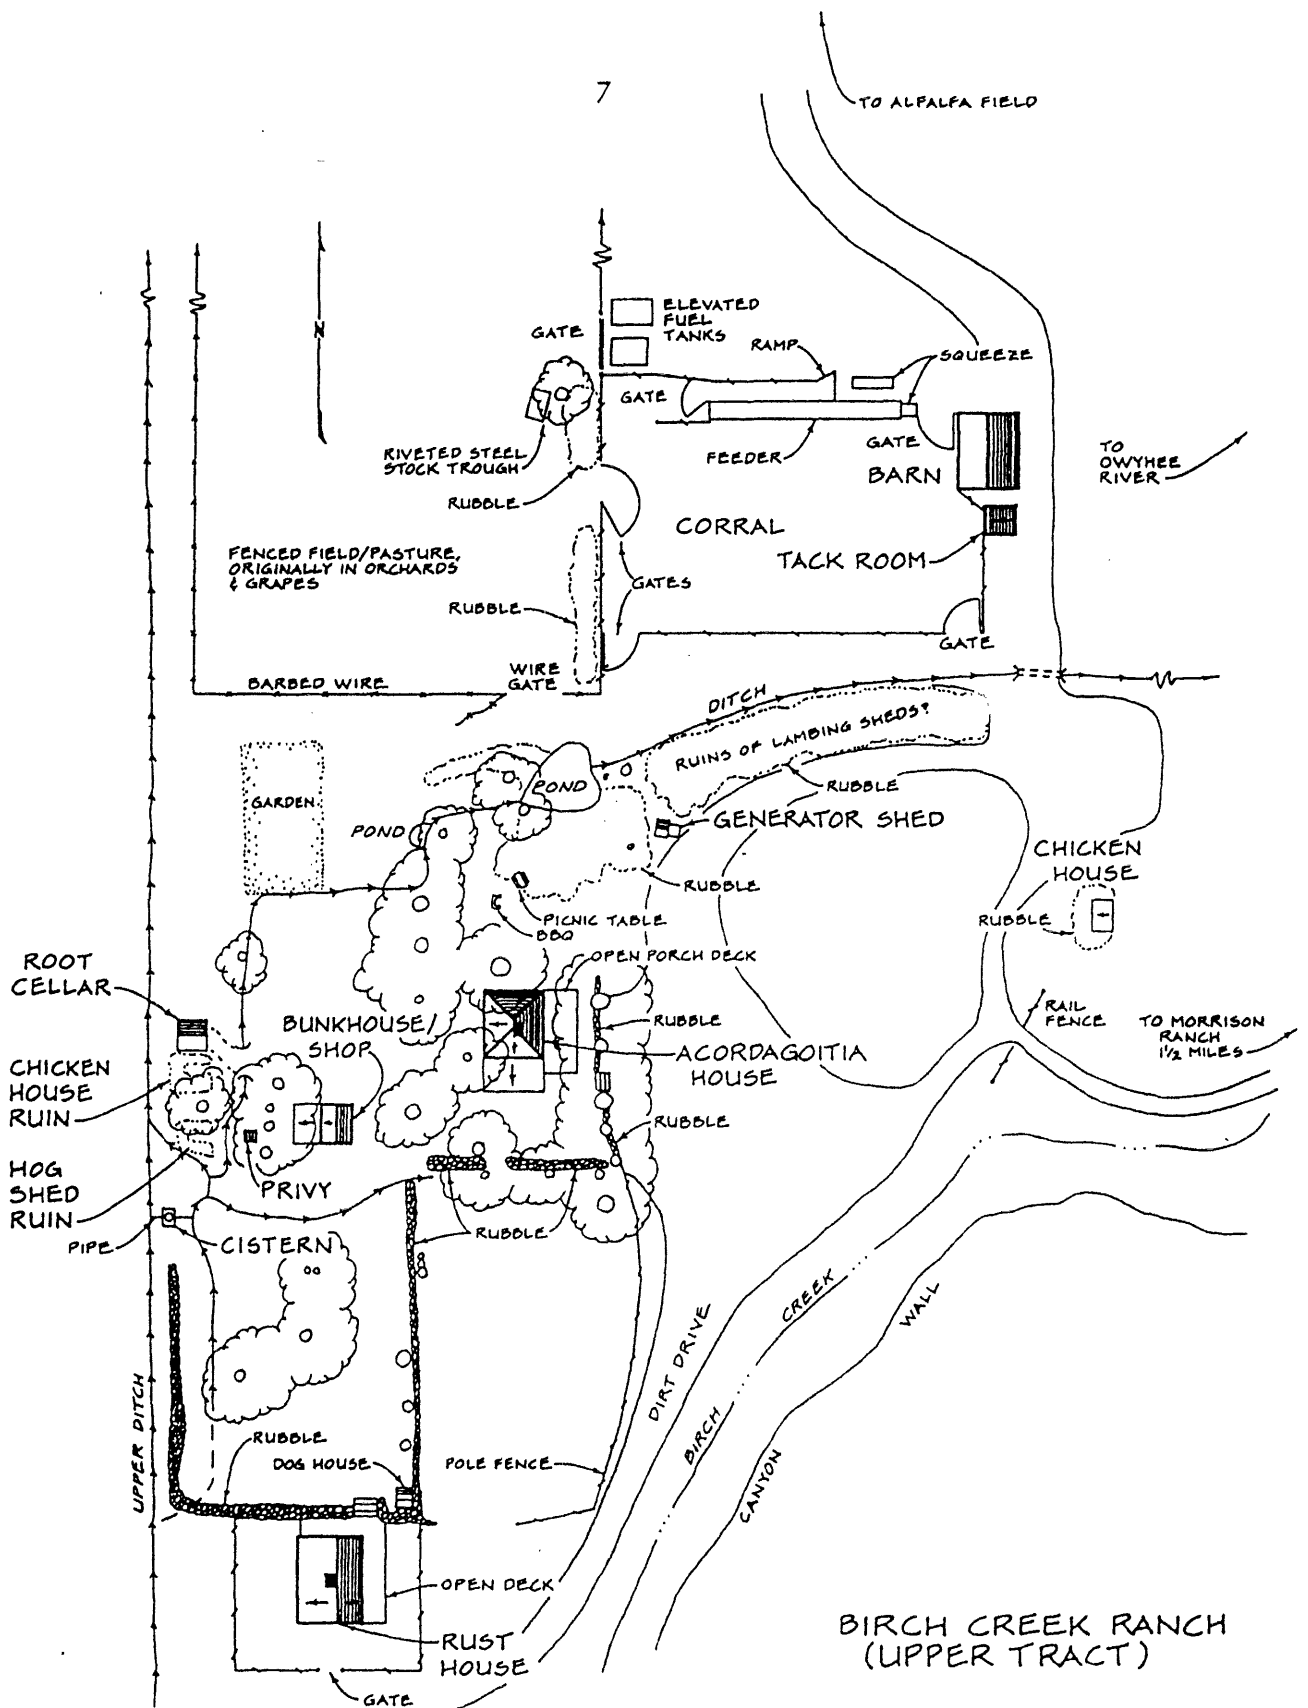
Birch Creek Ranch (Upper Tract) headquarters site plan (September 1995).
